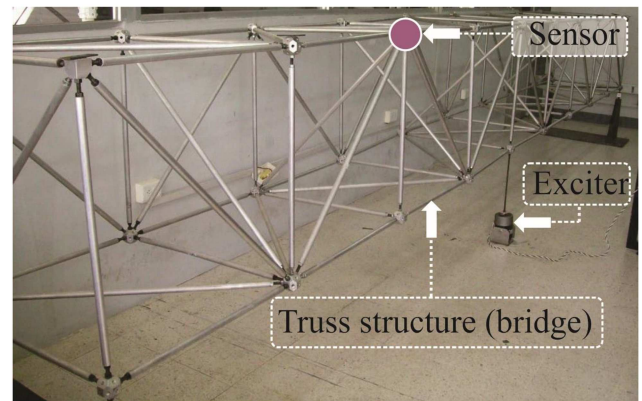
3D 9-bay truss-type bridge with corrosion damage (adapted from Moreno-Gomez et al. [41]).
